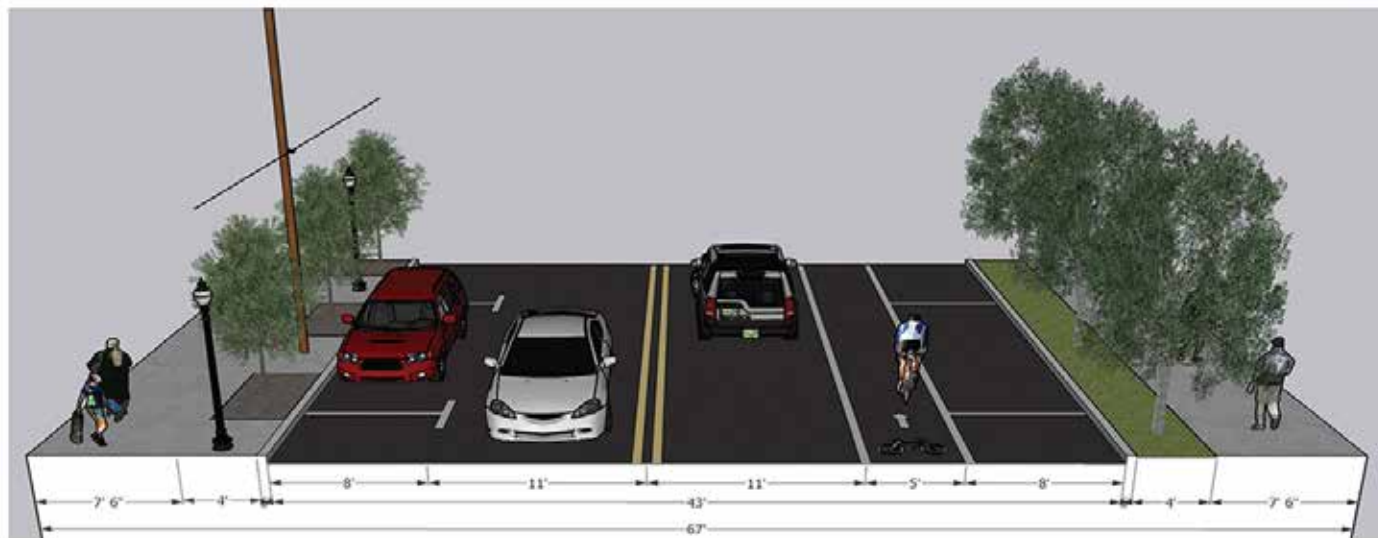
Albany Street : Schenectady St to Craig Street Design Concept Cross-Section (with the exception of the block between Georgetta Dix Plaza and Germania Ave, which is shown separately)
